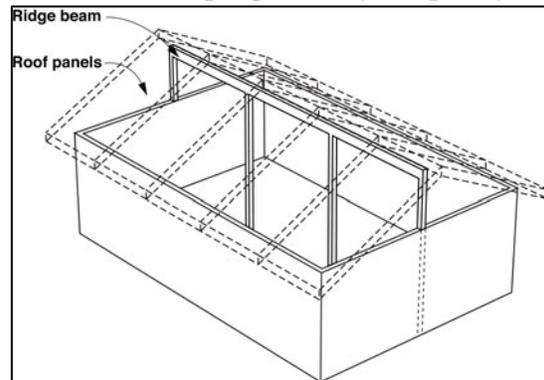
Panelized Roof System with Low Sloping Roof (6/12 pitch)
